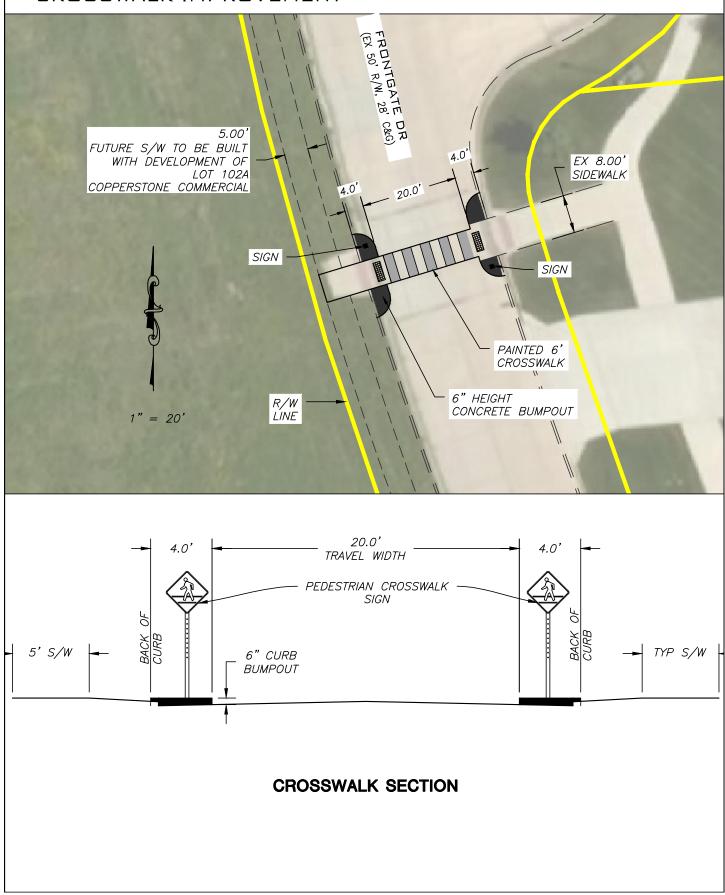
EXHIBIT B: FRONTGATE DR CROSSWALK IMPROVEMENT
